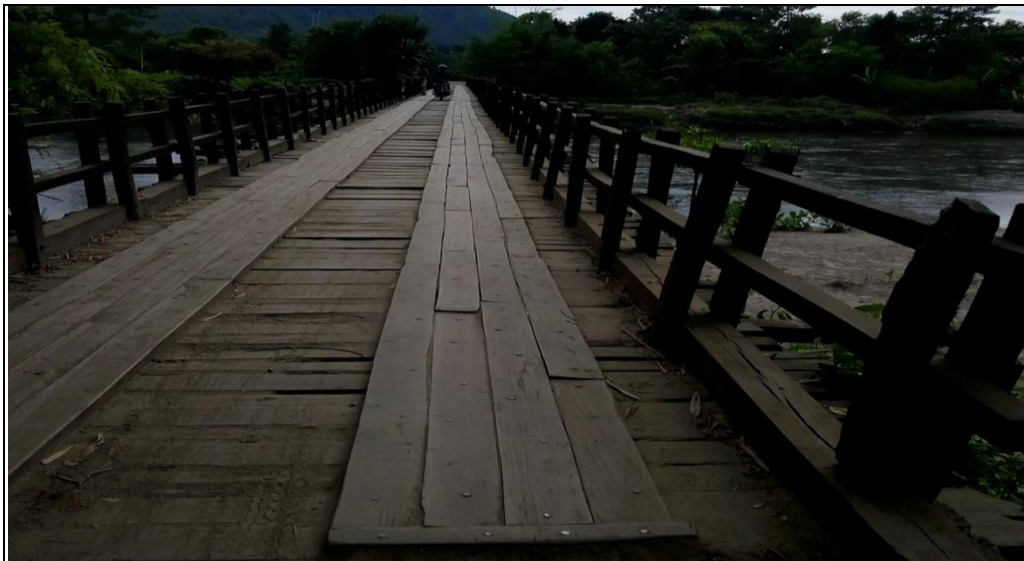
Wooden Bridge (Chainage- 35.348 km)
